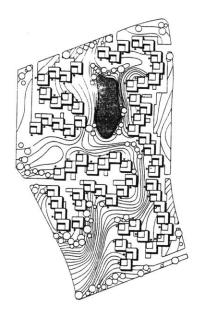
Terrace Houses at Fredensborg, North Zealand, 1962-63, general site plan and ground floor plan of a typical unit with garden.
